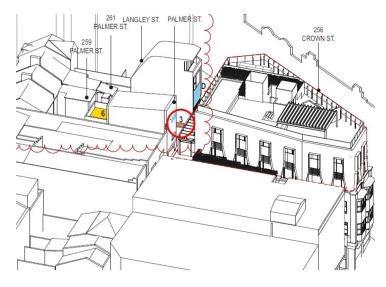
Views from the sun of the development at 12.30pm at June 21 (private open space are of 261 Palmer circled in red).
